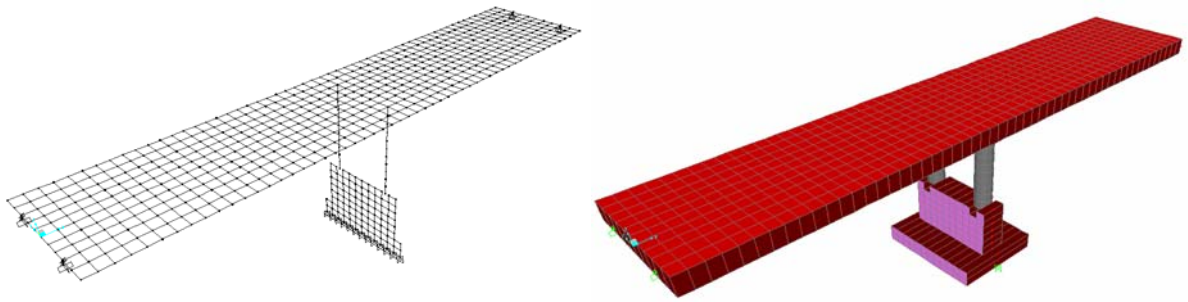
Finite element model (c) of the bridge using shell elements for the deck and the base
